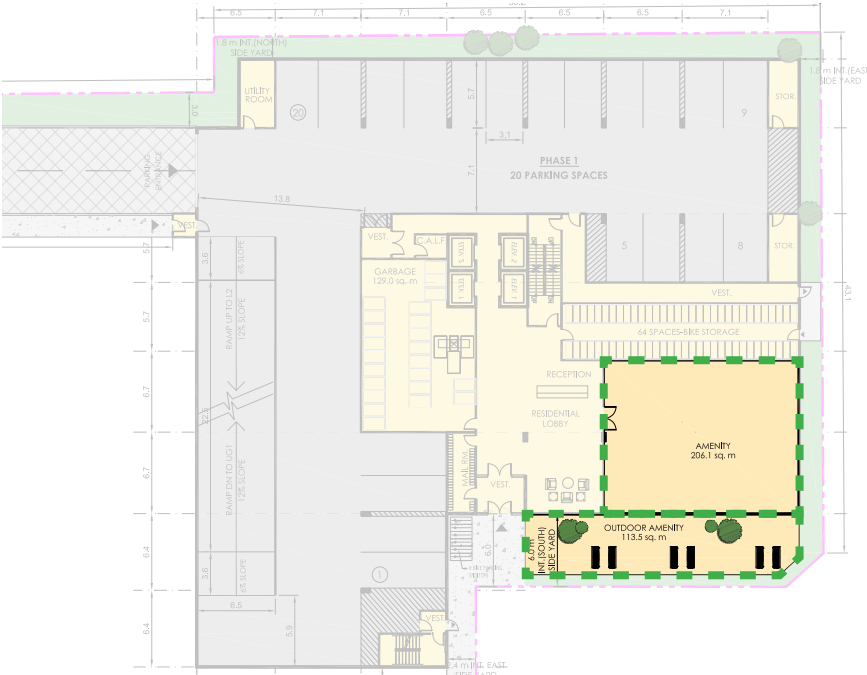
Indoor and outdoor amenity spaces on the ground floor
